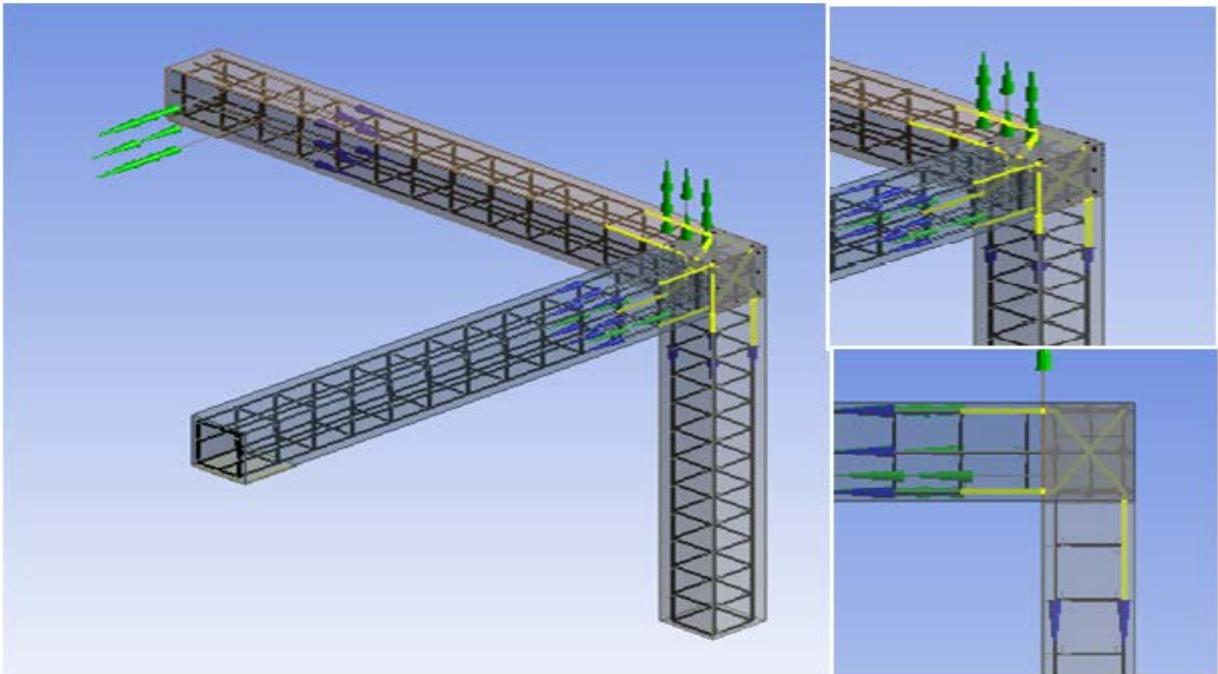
Modified reinforcement detailing of corner joint (SS5)
